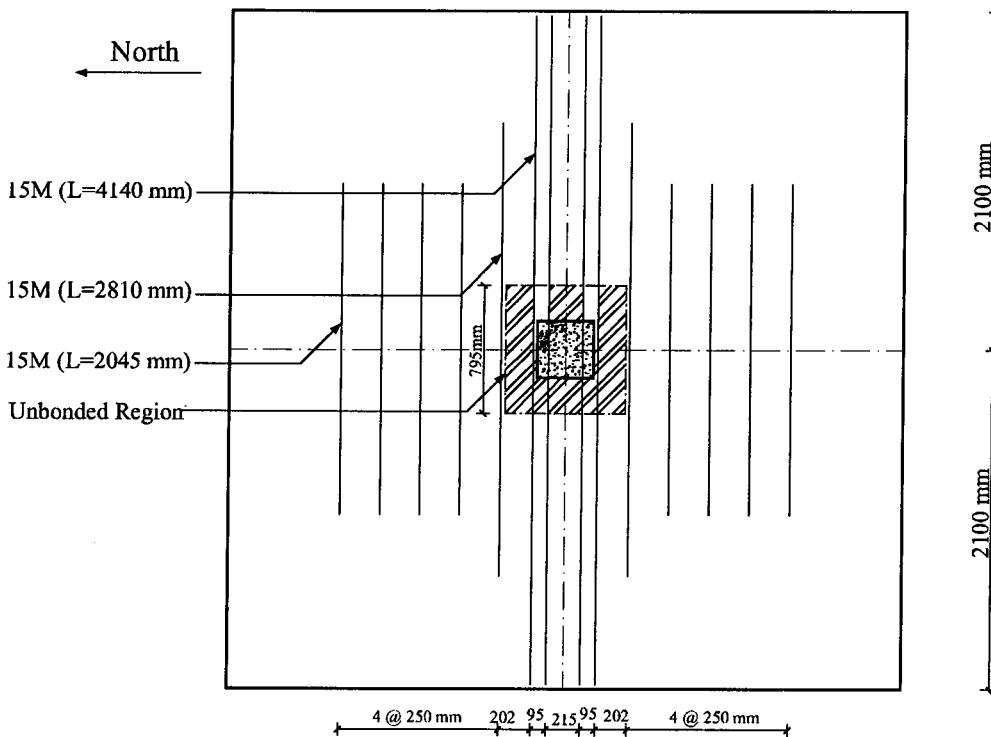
Layout of Negative Reinforcement in E-W Direction
